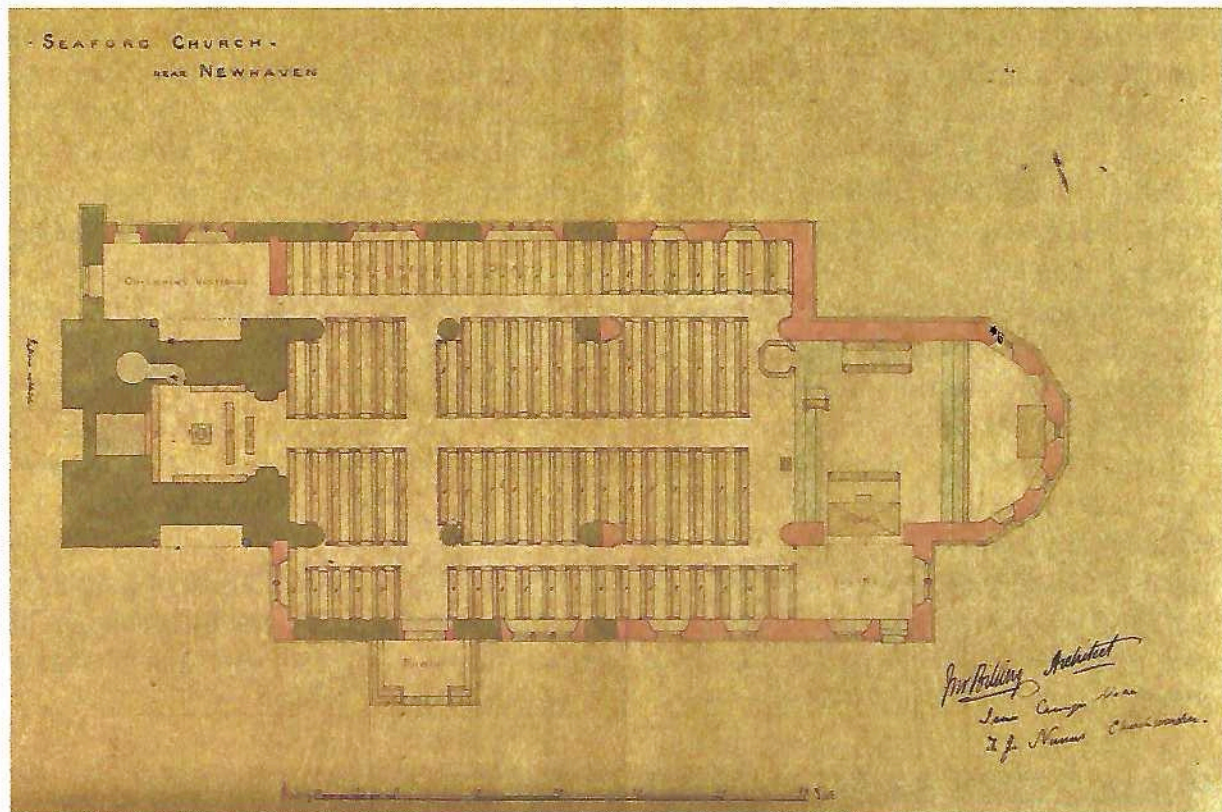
1861 Approved plan of the church renovations Courtesy of PCC
